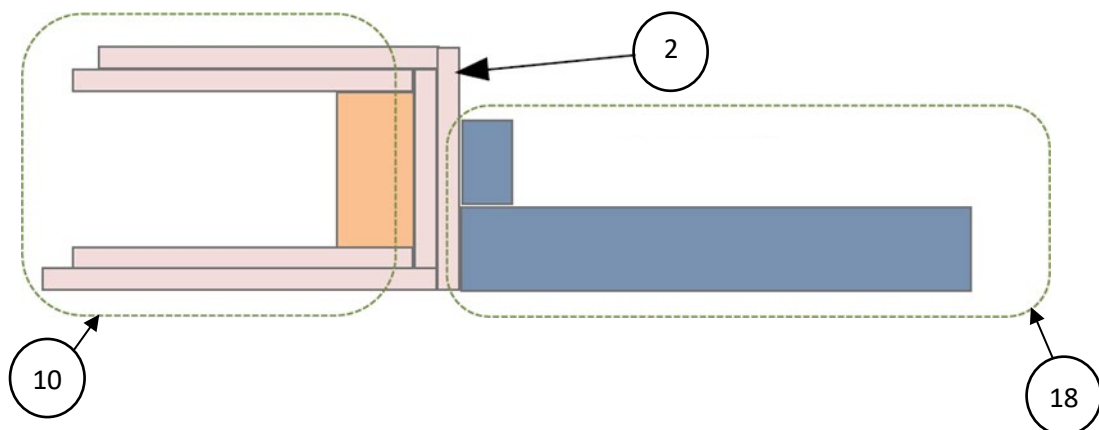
Framing out opening for access panels in a timber-framed wall assembly – Plan view
